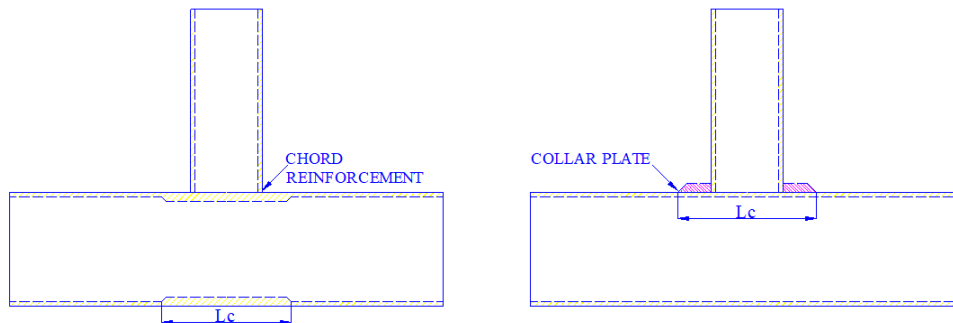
Tubular joint showing chord reinforcement and collar plate
